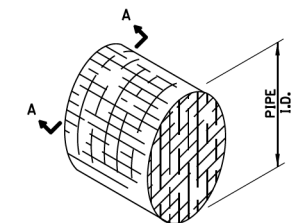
DETAIL OF PIPE UNDERDRAIN OUTLETS
